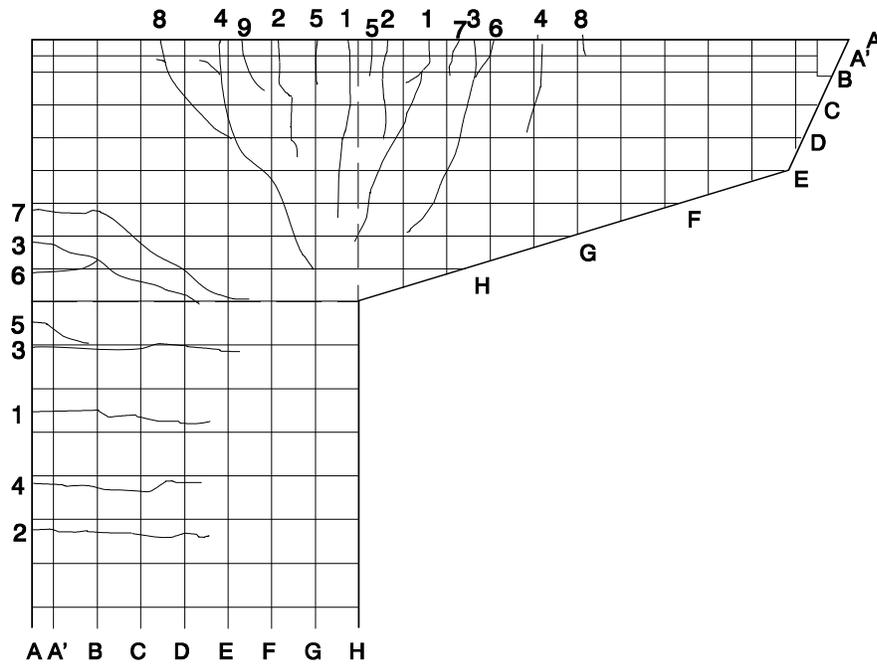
Cracking patterns on north face of Specimen POJ-PU-74-TH at end of test (no failure)
